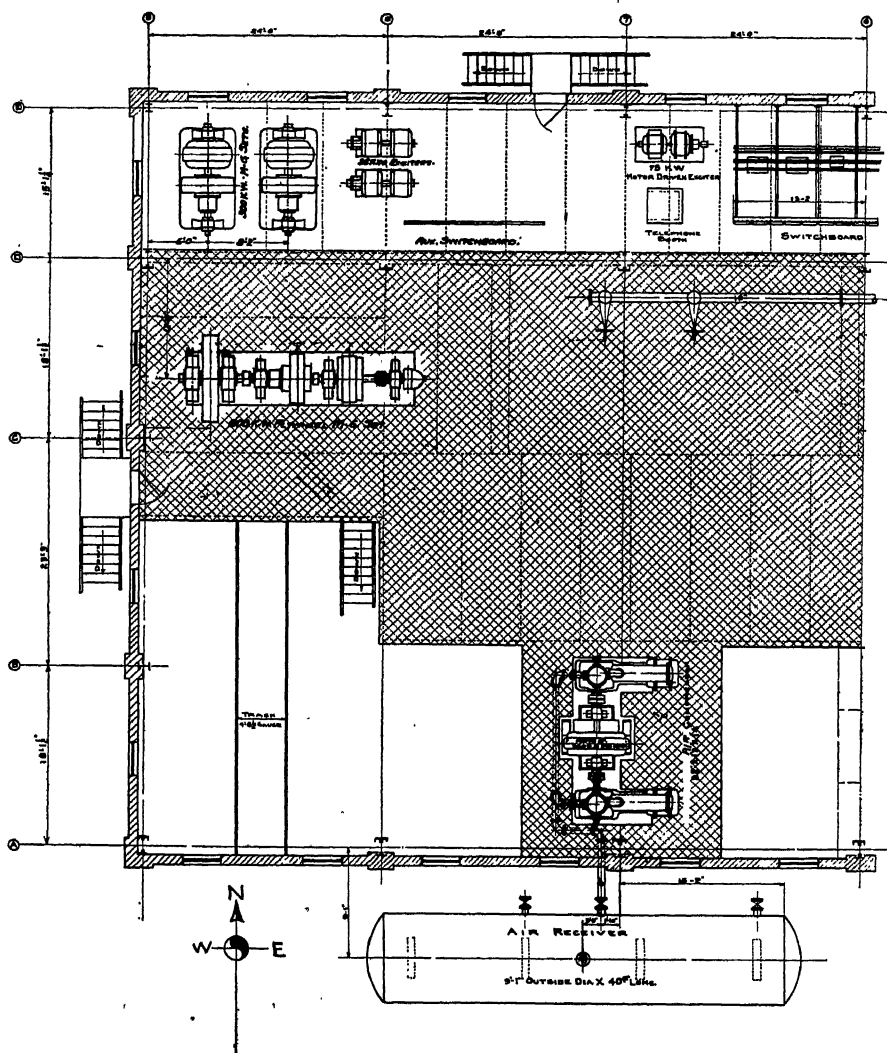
BASEMENT FLOOR PLAN, COLUMNS 6 TO 9.
